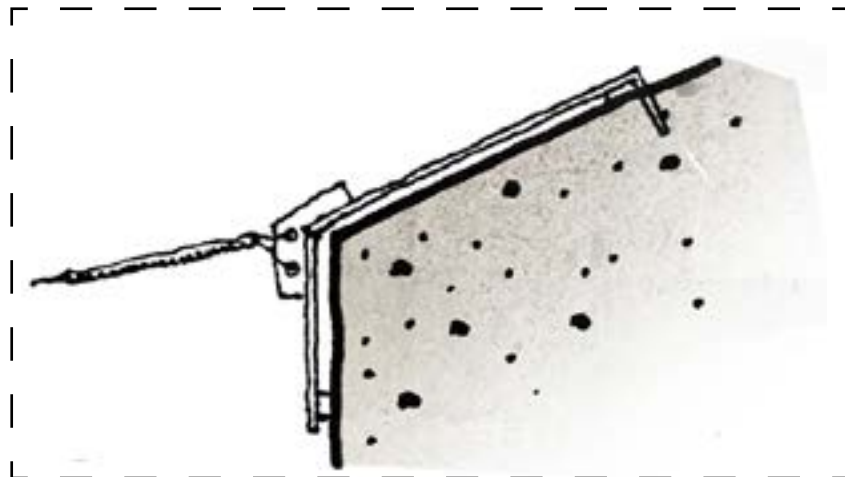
J: [DETAIL 3] Cable connection to concrete roof (Author, 2021)
